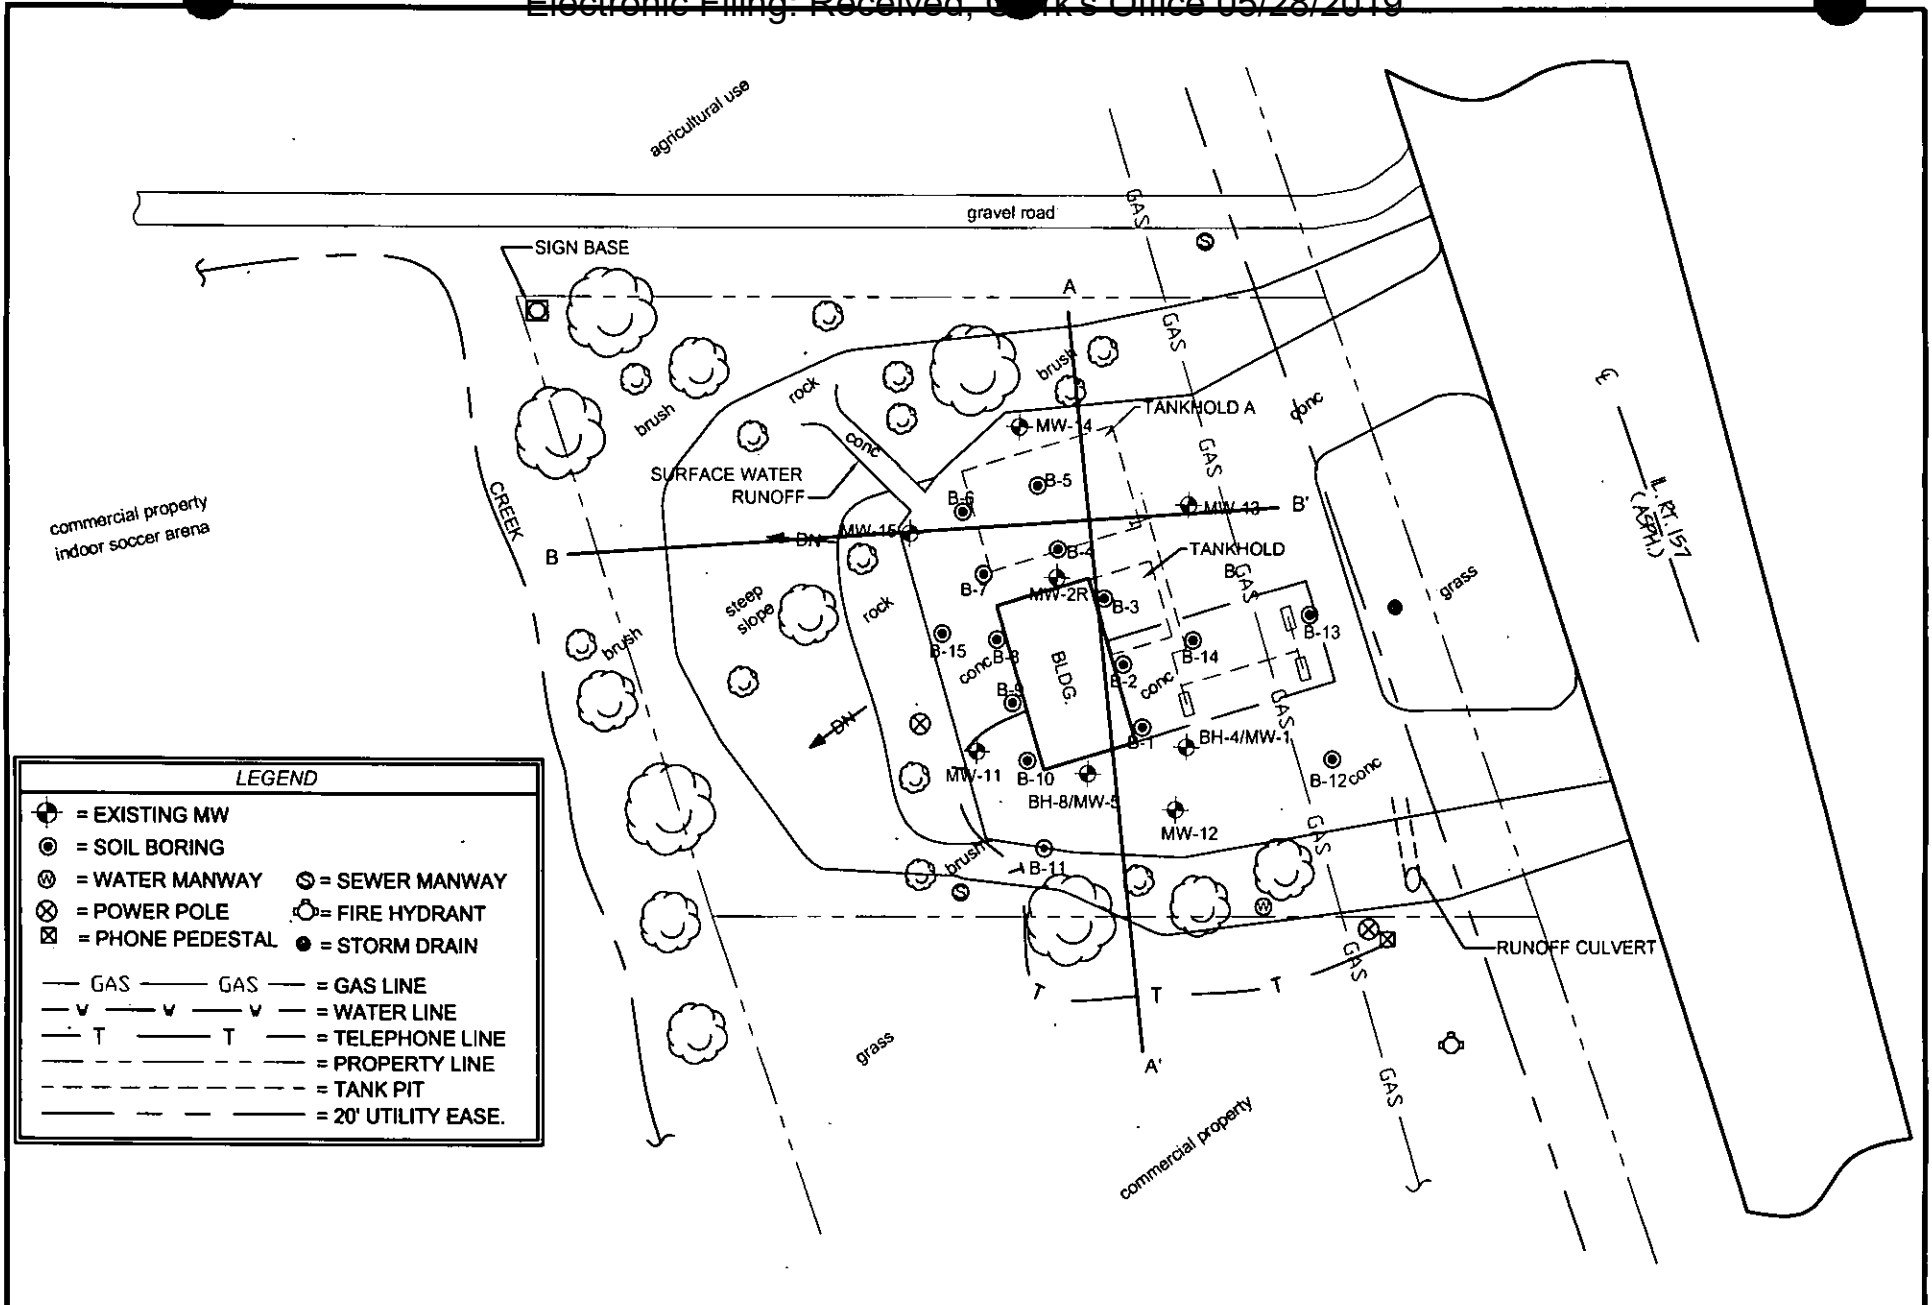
SITE LAYOUT WITH RECENT BORING/MW LOCATIONS
